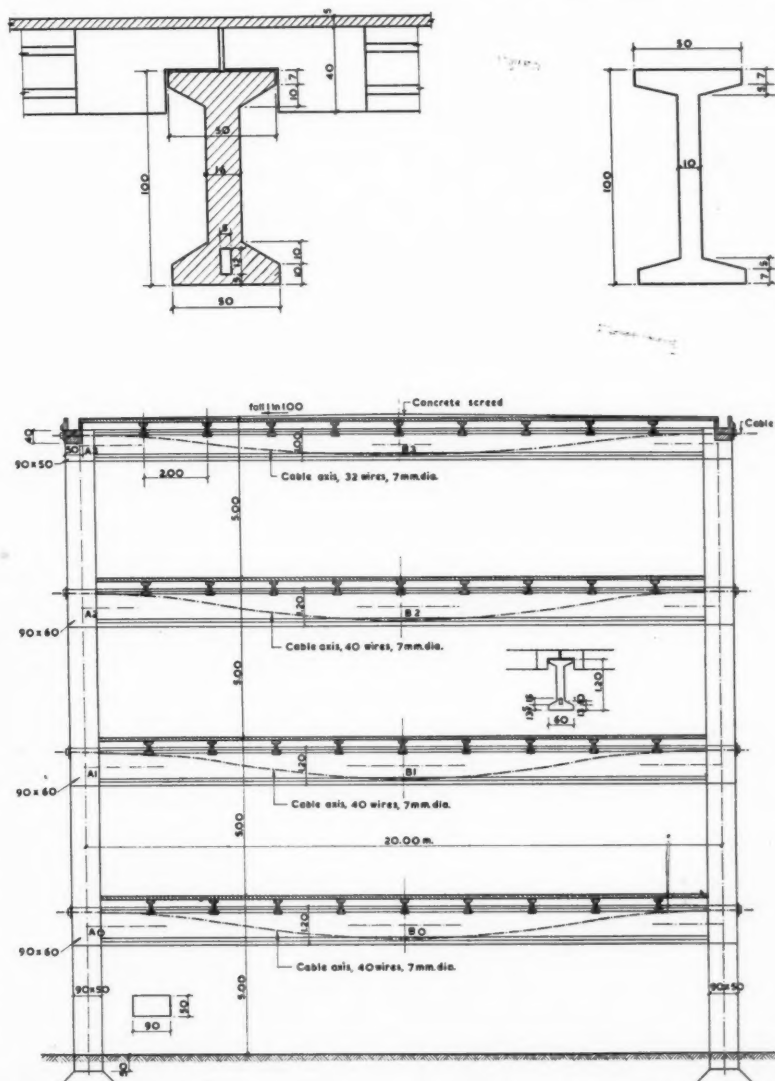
(See page 478). Simple frame, span 66ft., with prestressed concrete beams. Top left, section of monolithic beam; top right, beam of precast blocks.
